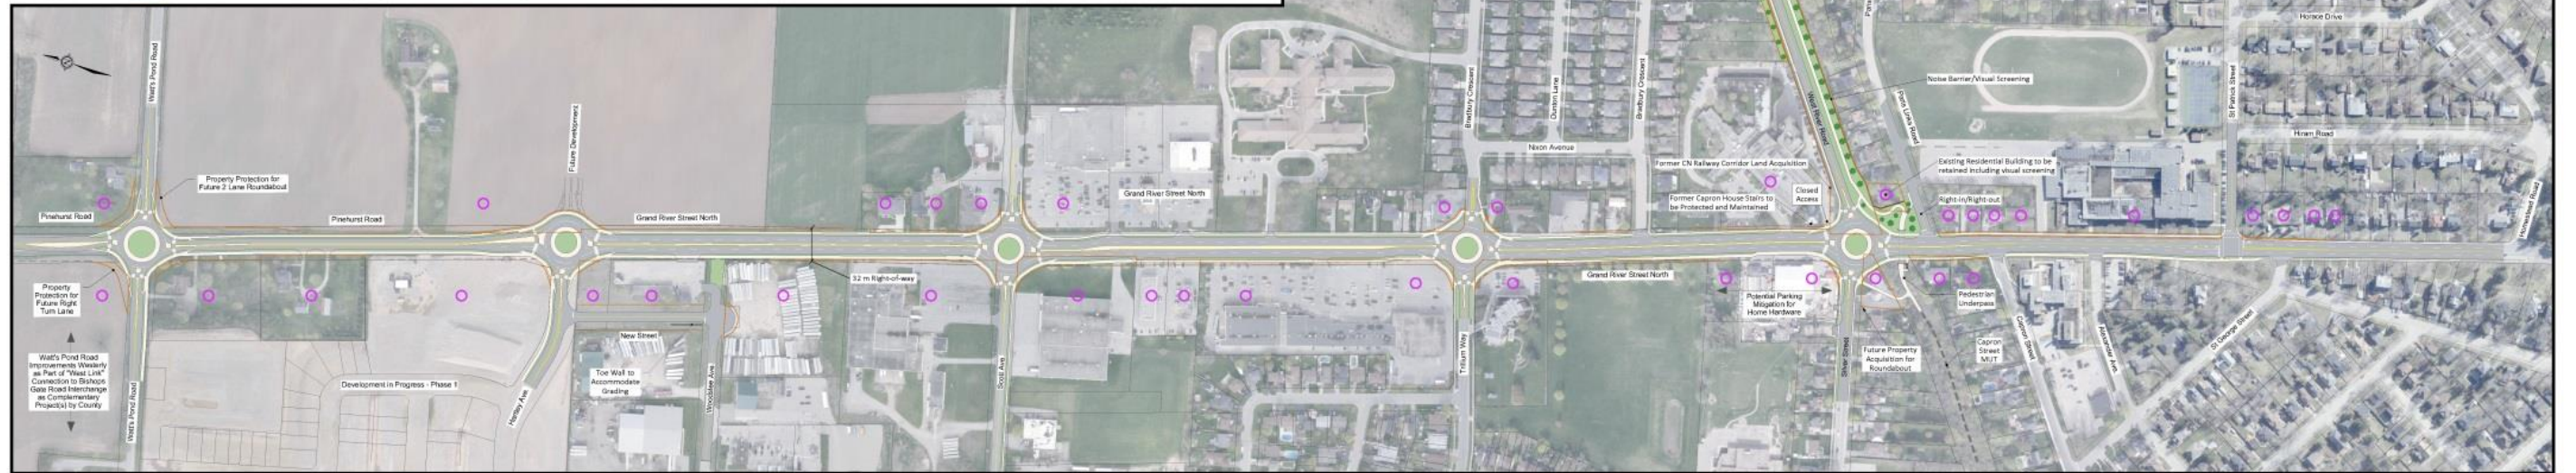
Technically Preferred Alternative (Watts Pond Road to Homestead Road)
